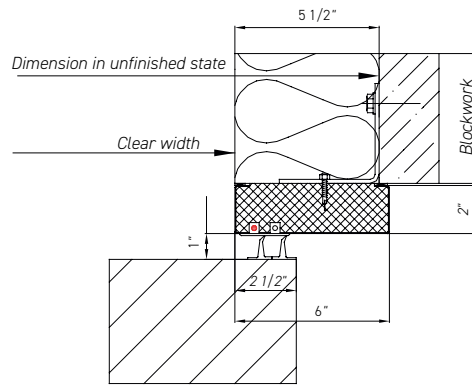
Blockwork / Flat frame, bracket mounting
